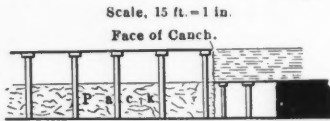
LONGITUDINAL SECTION OF A GATEWAY
